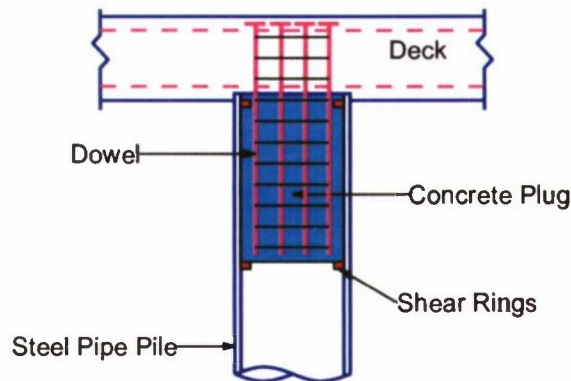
Concrete-plug connection between hollow steel pile and concrete deck.
